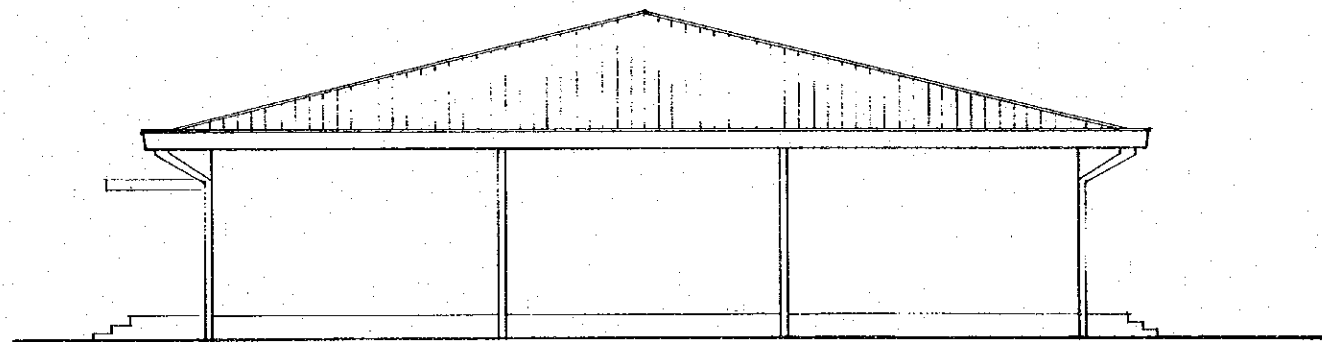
ELEVATION — KATHMANDU STUDIO CENTER
